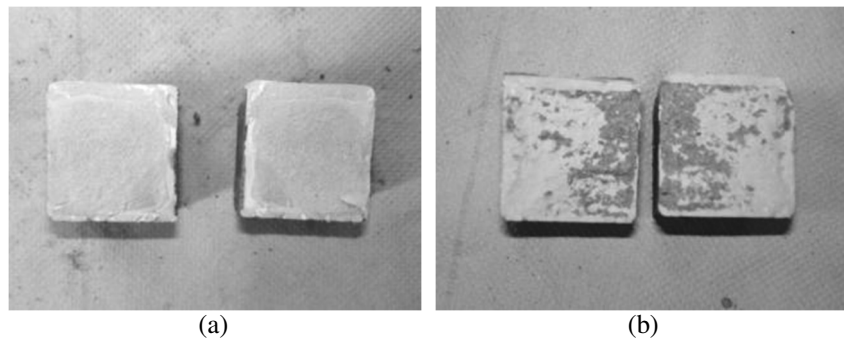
Failure modes of the adhesion specimens tested at KULeuven: (a) failure by the grout and (b) failure by the interface grout-beam.
